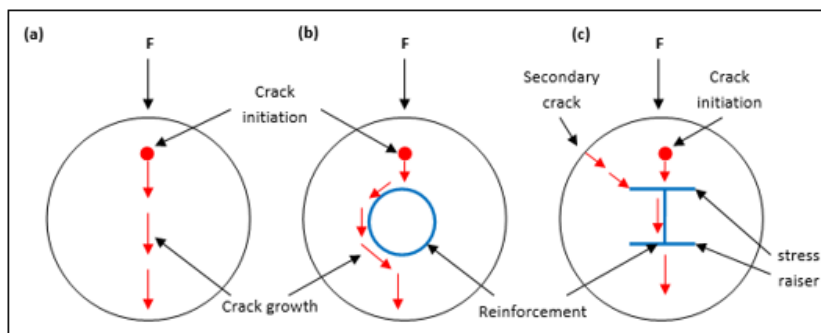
Illustration of crack pattern of concrete cylinder (a) without reinforcement; (b) hollow reinforcement and; (c) I-beam
